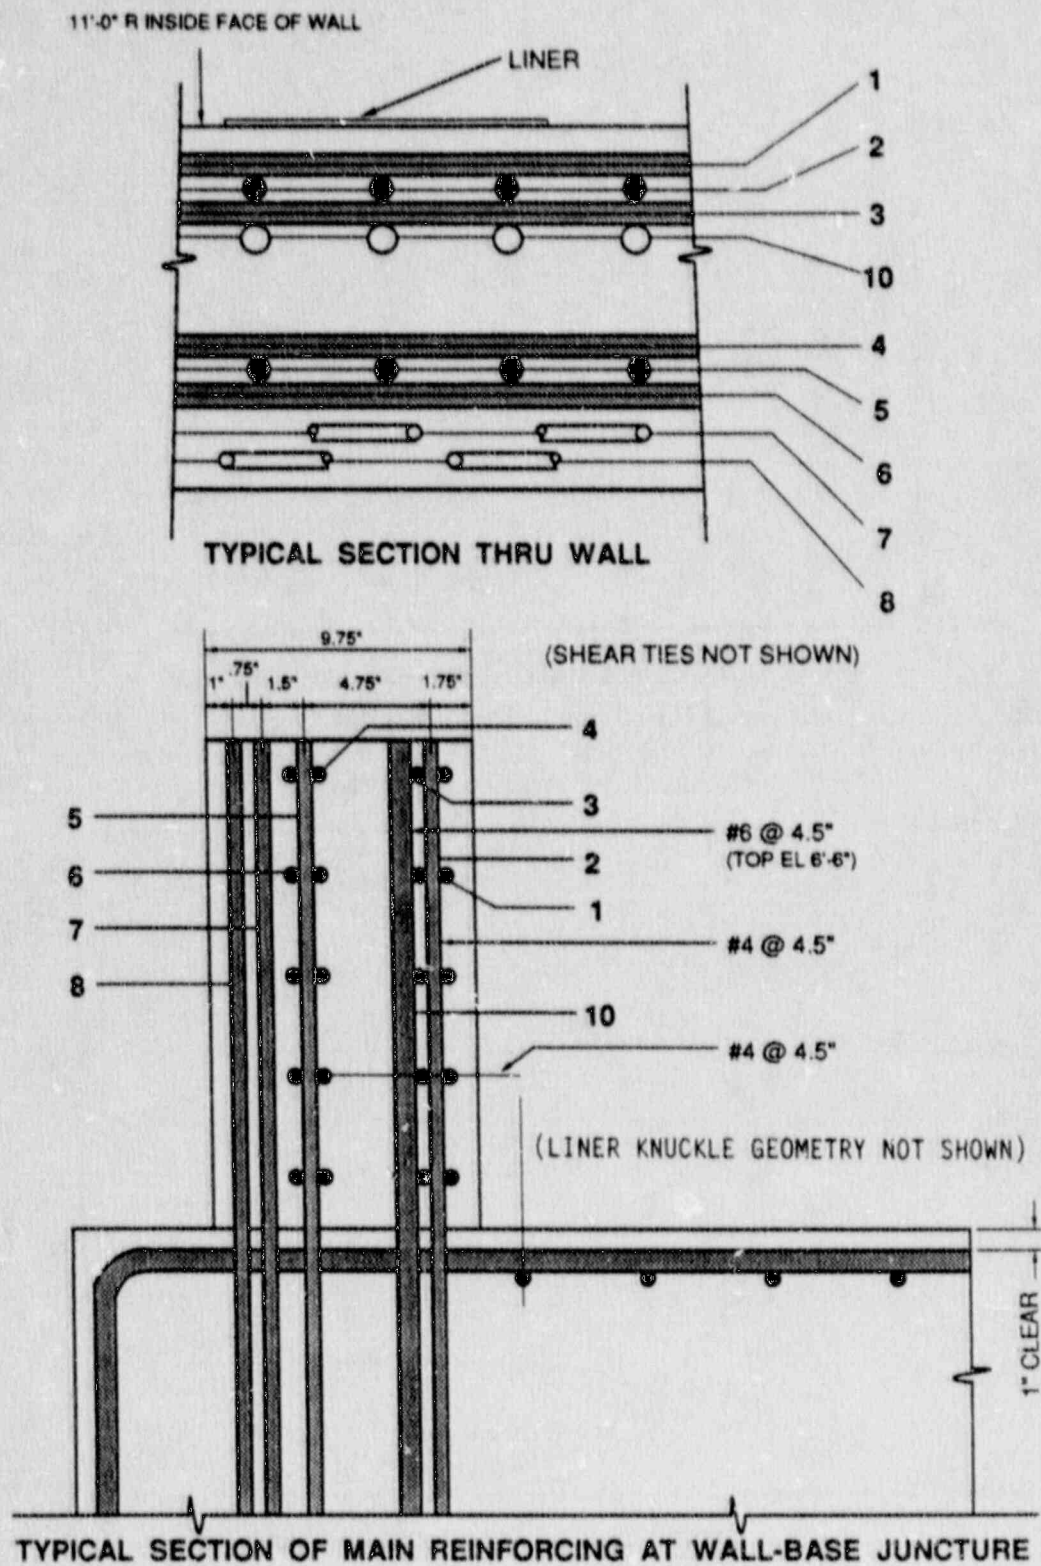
1:6-Scale Model Typical Wall Cross-Section with Identification of Rebar Layers
